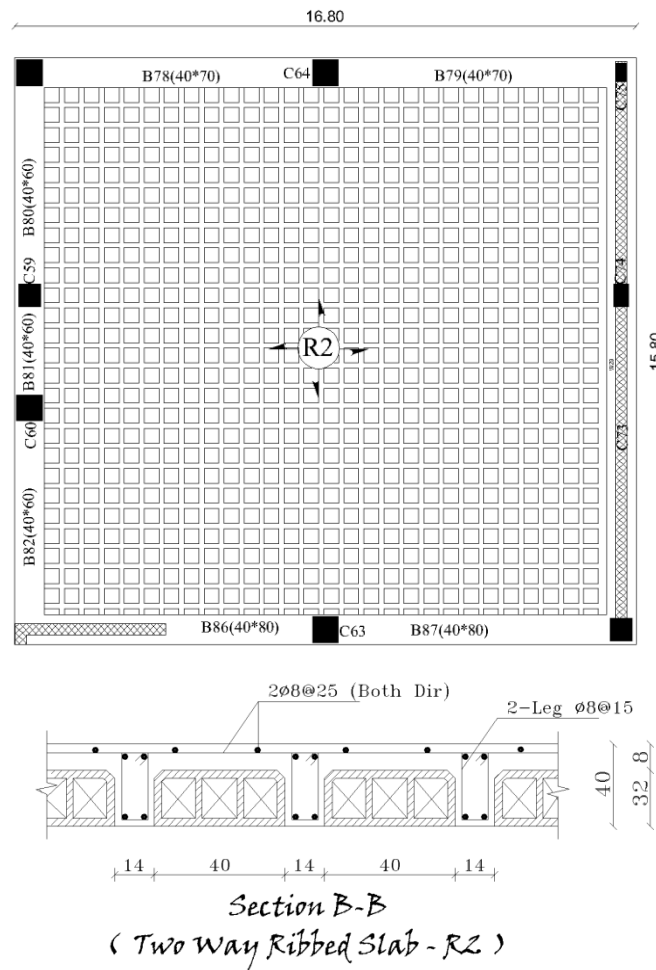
Plan and Section in Two Way Ribbed Slab ( R2 )
